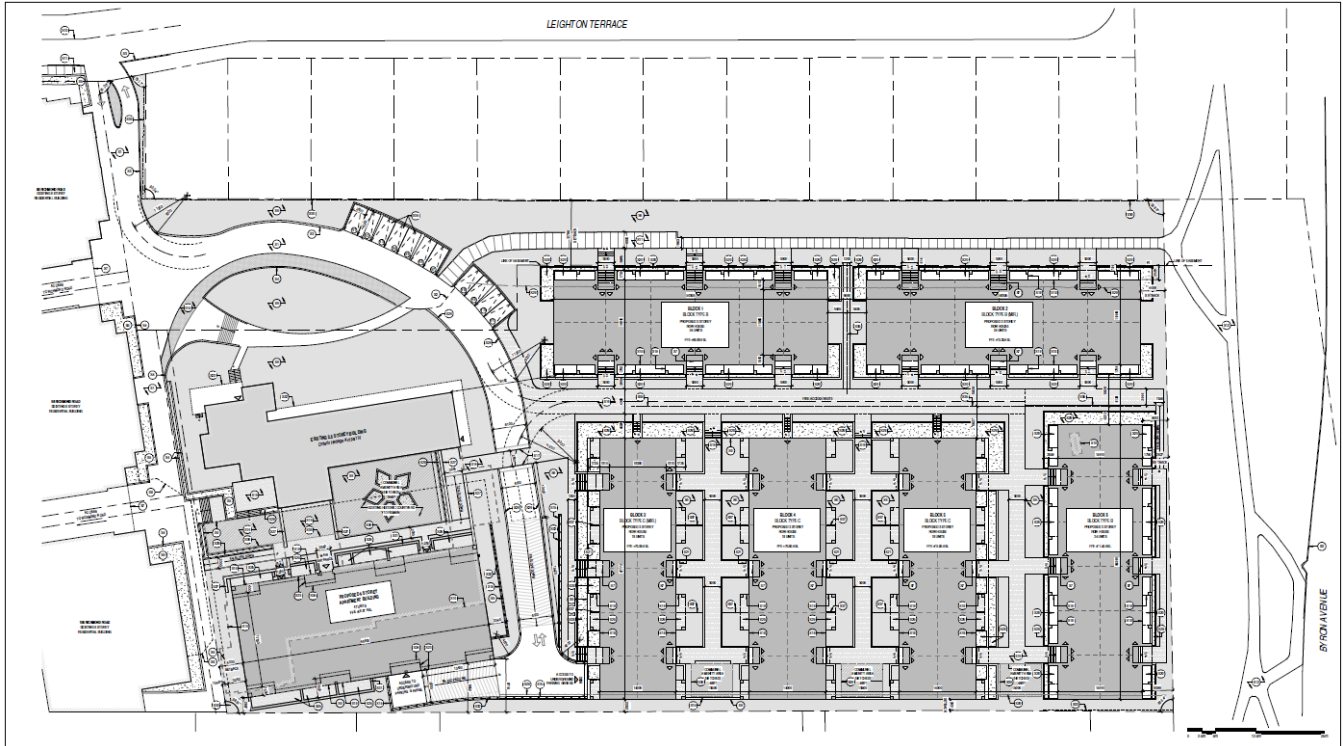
Excerpt of the Site Plan (Source: Project1 Studio)
